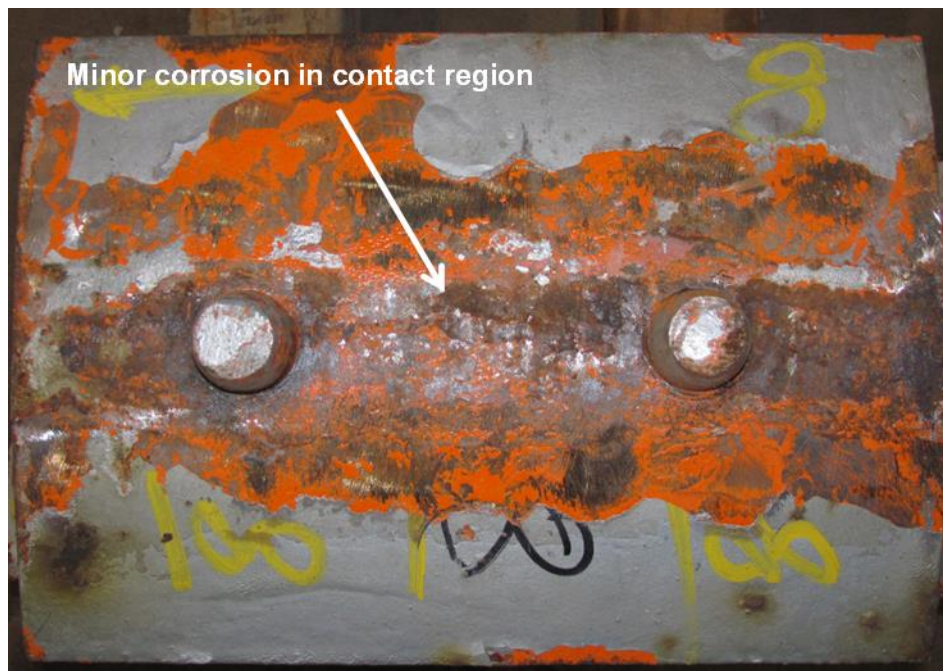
Top cylindrical surface of Bearing PR8 in the as-received condition
